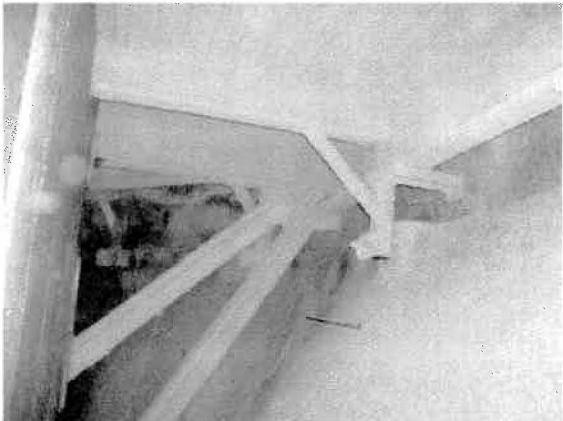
Staining noted in interstitial space at 45 degree bend in precast
